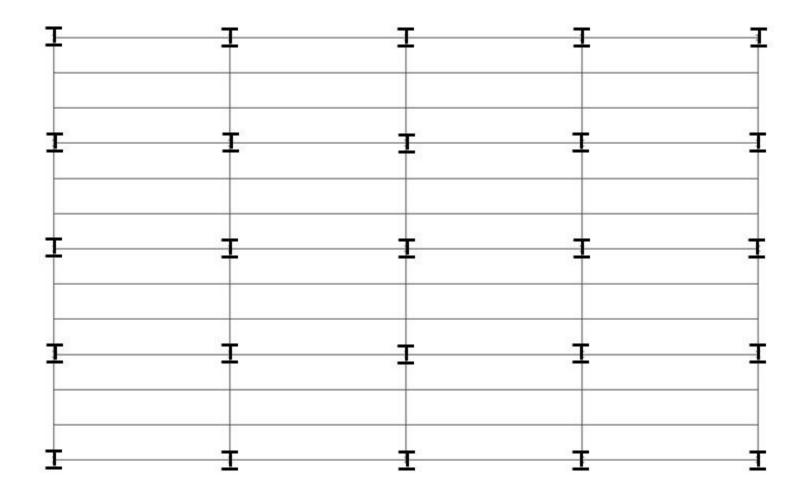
TRADITIONAL CARIBBEAN STEEL MOMENT-FRAME CONCEPTUAL DESIGN
